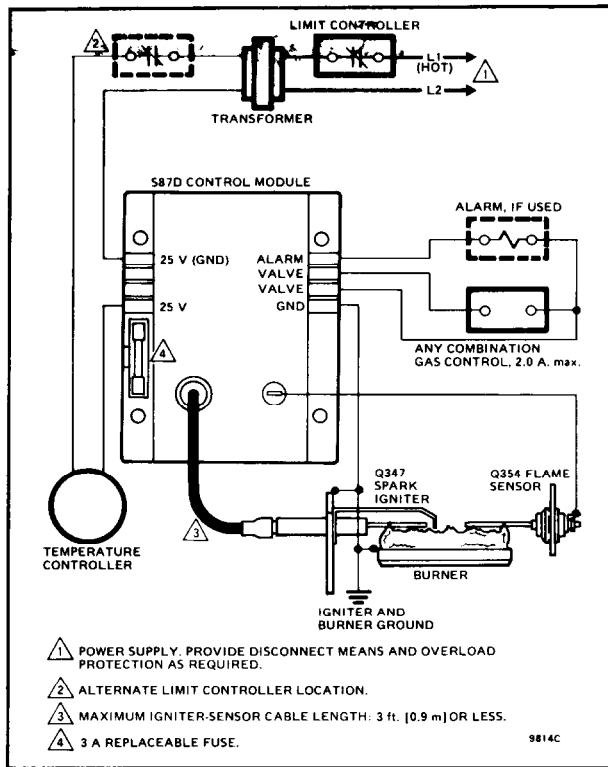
WIRING HOOKUP FOR Y343B PACKAGE IN A TYPICAL DSI HEATING SYSTEM.
